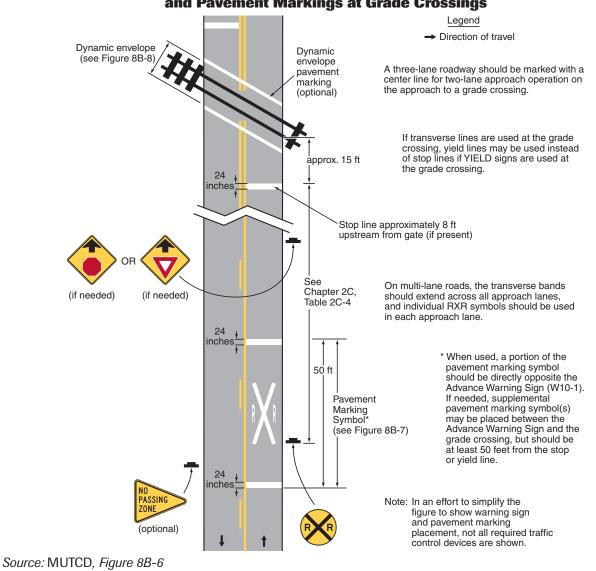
Example of Placement of Warning Signs and Pavement Markings at Grade Crossings
